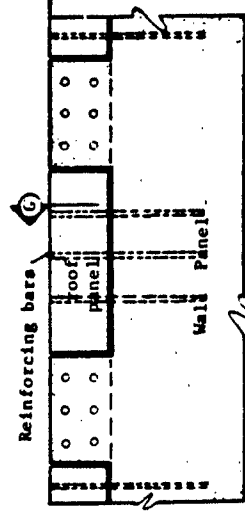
ELEVATION--PINNED LAP JOINT.
